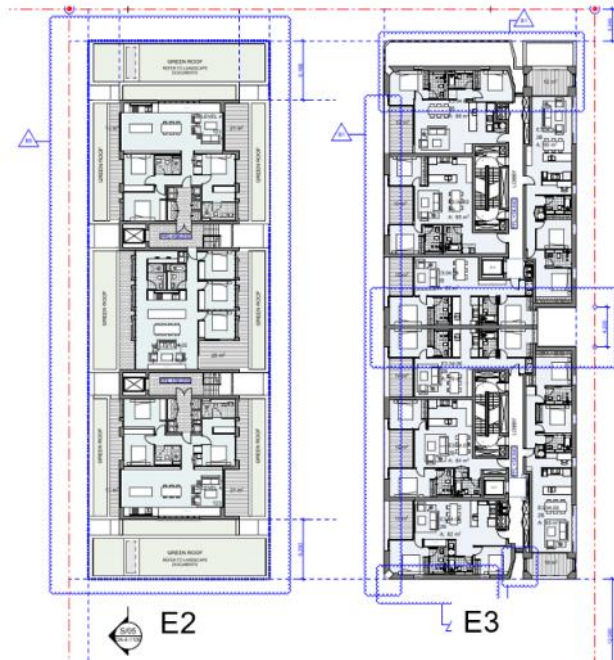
Plan showing the additional 5th storey proposed to Building E2
